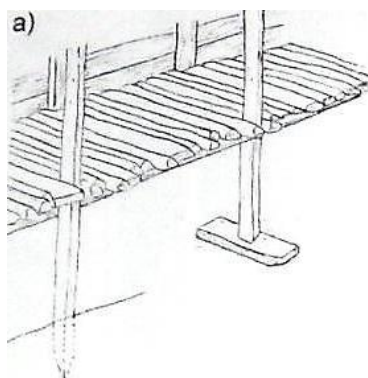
Different kinds of lake-dwelling house floors: elevated floor of a pile-dwelling (from Menotti 2012: 134, figure 4.3).
